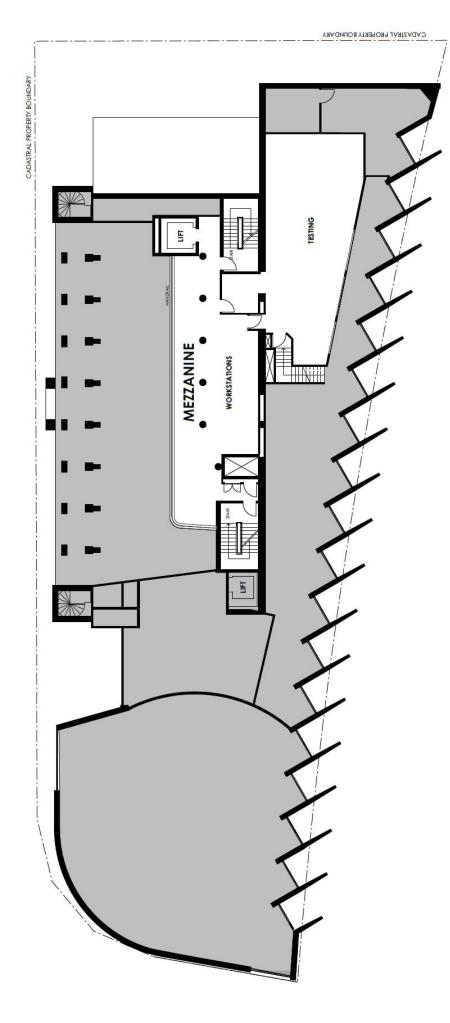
Floor Plan, Mezzanine (Level 4) Source: ML Design 2016
